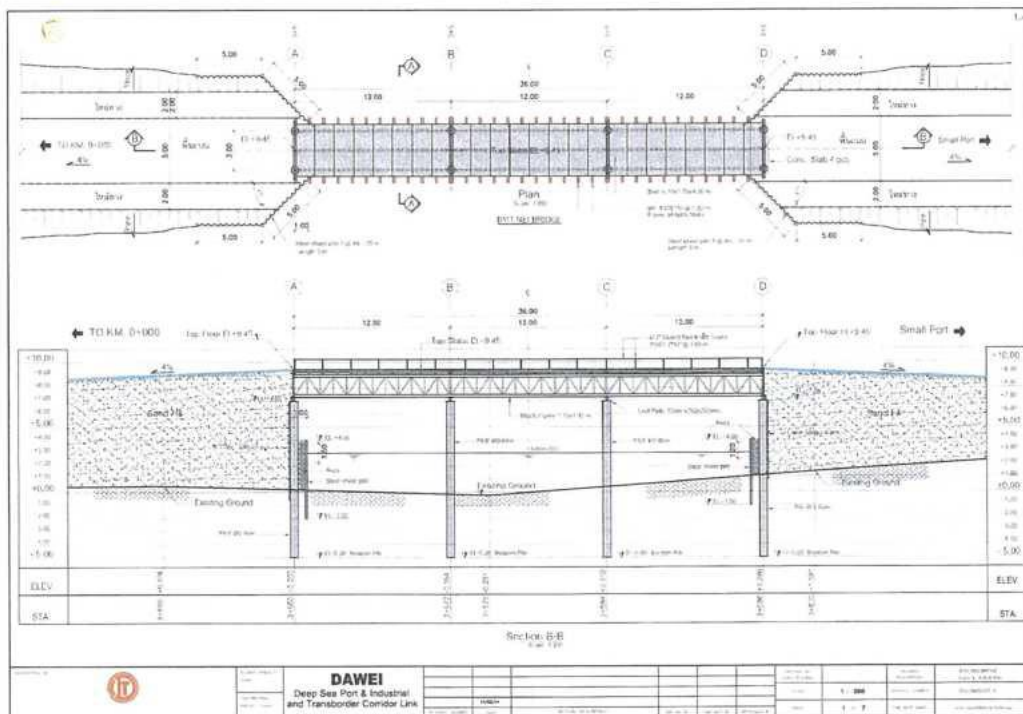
LAYOUT OF BRIDGE
